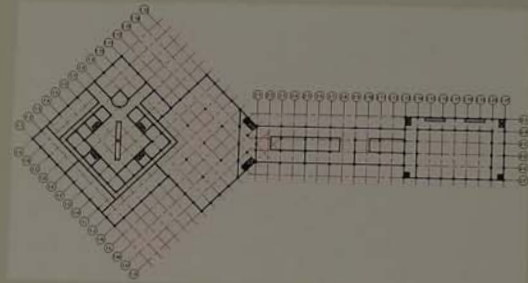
AutoCAD Structural Drawing - 1st Floor Plan View
